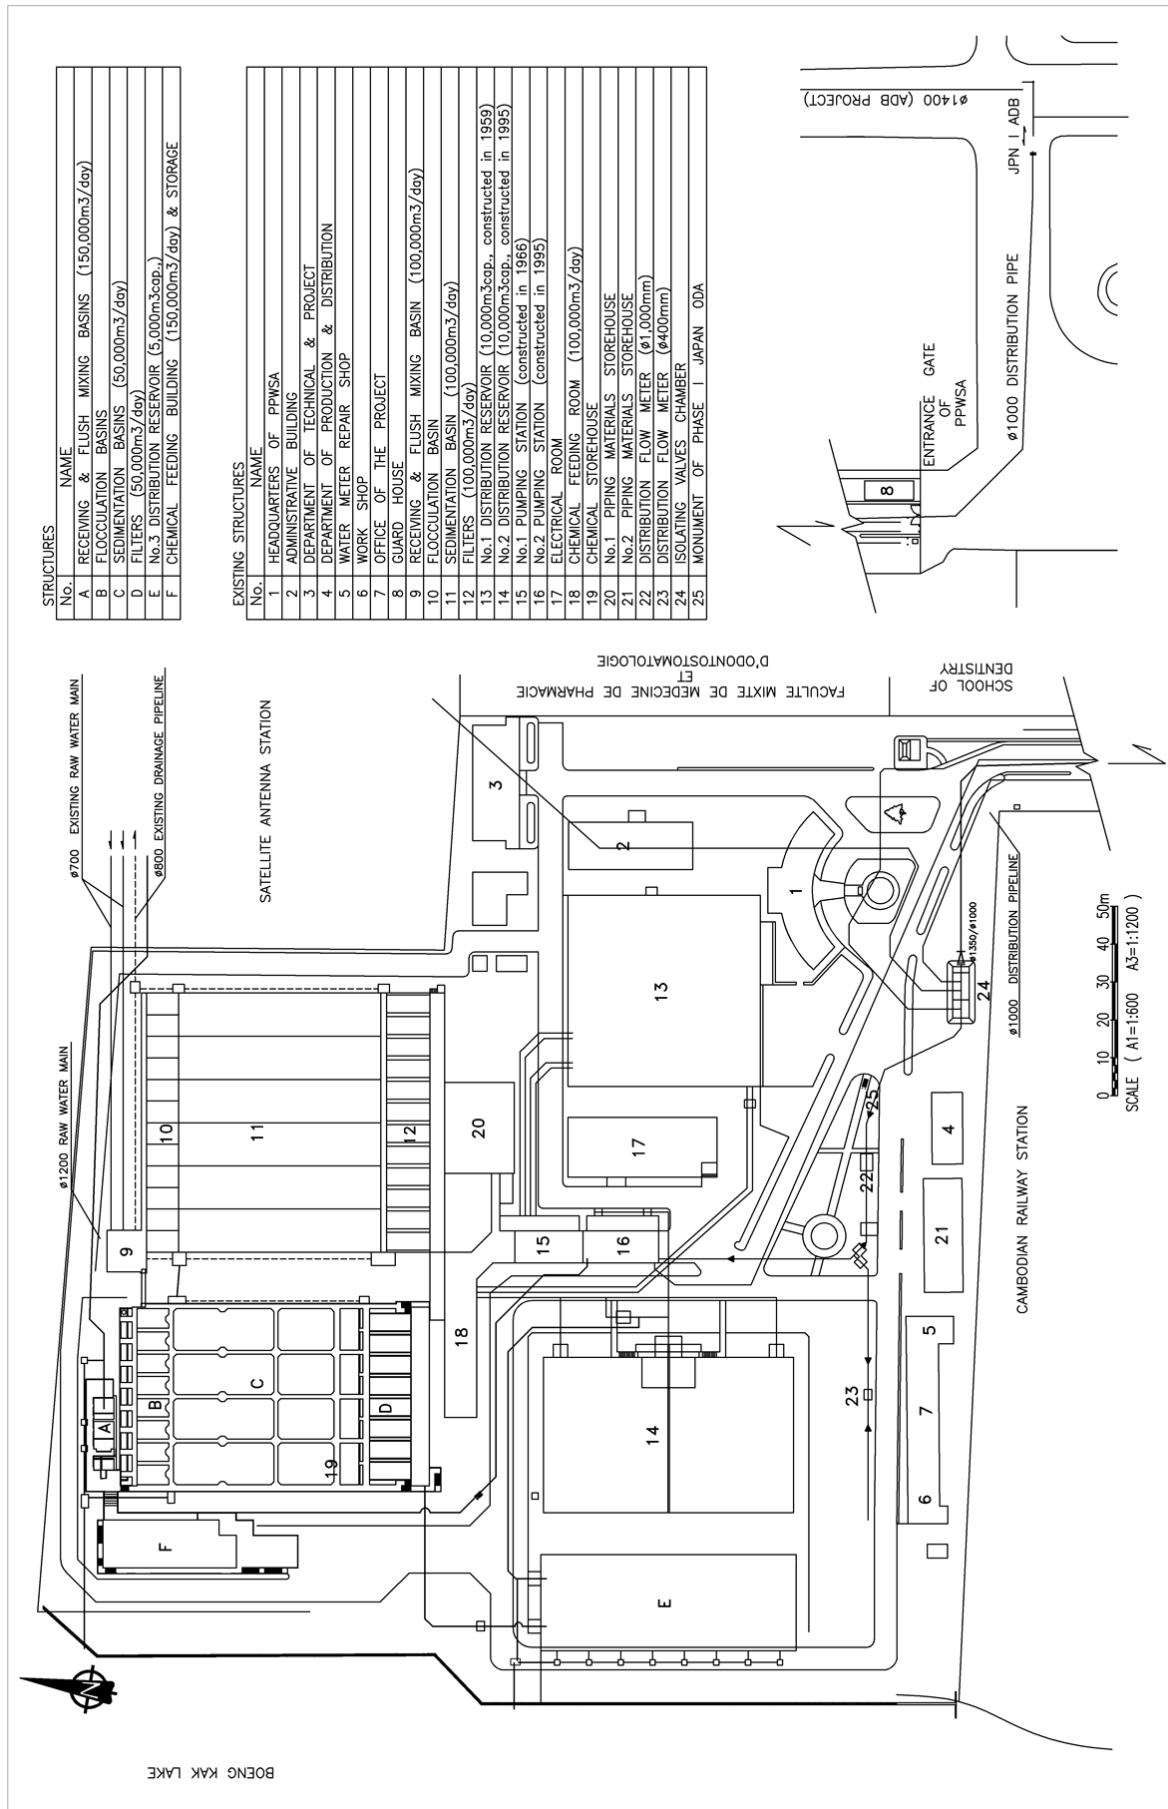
General Plan of the Water Treatment Site and Layout of the Facilities
